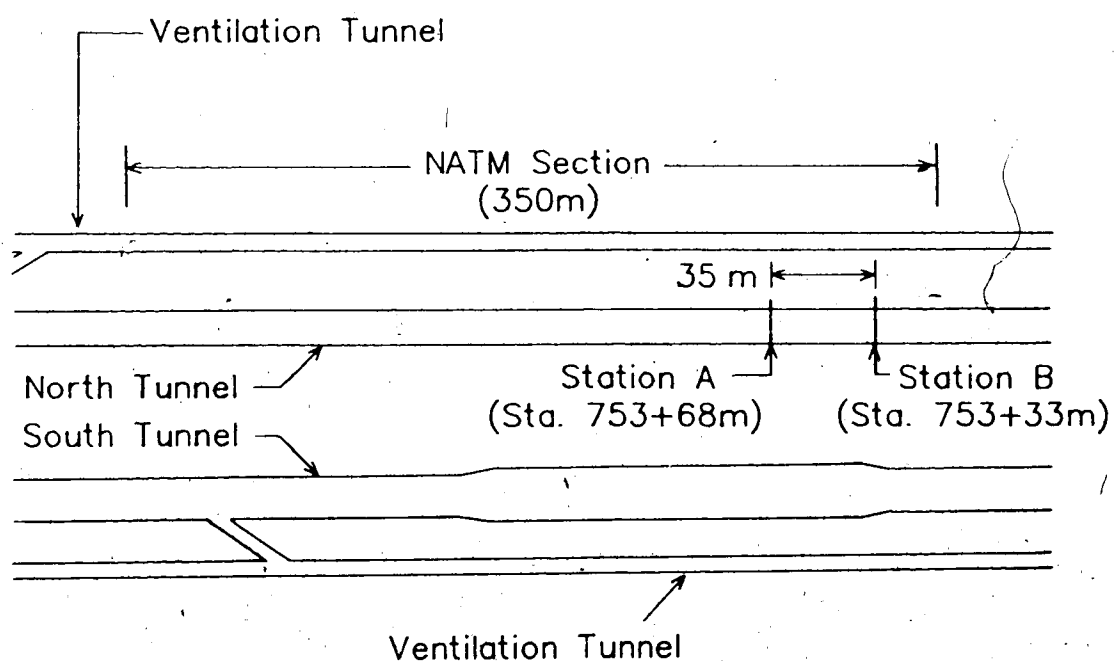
Plan View of East Section of Enasan Tunnel Project.
